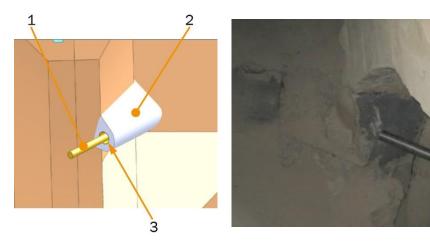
Protection tube covered with refractory concrete inside the kiln (example)
